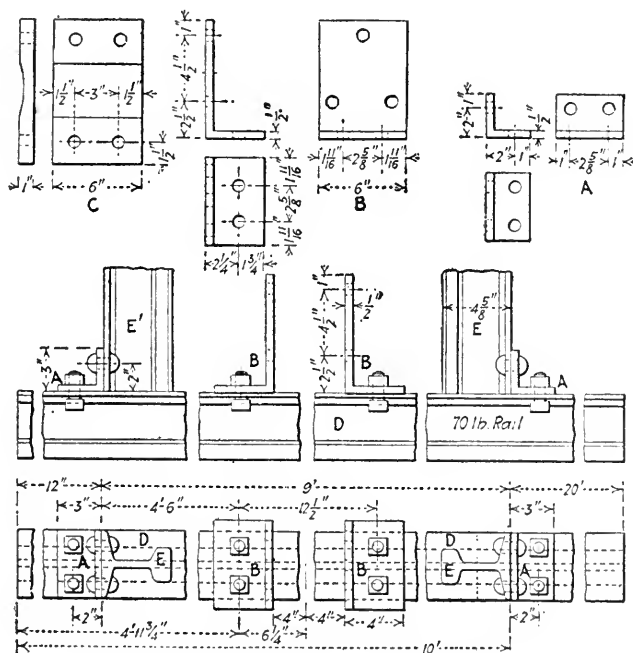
DETAILS OF STEEL SUPPORT FASTENINGS.
